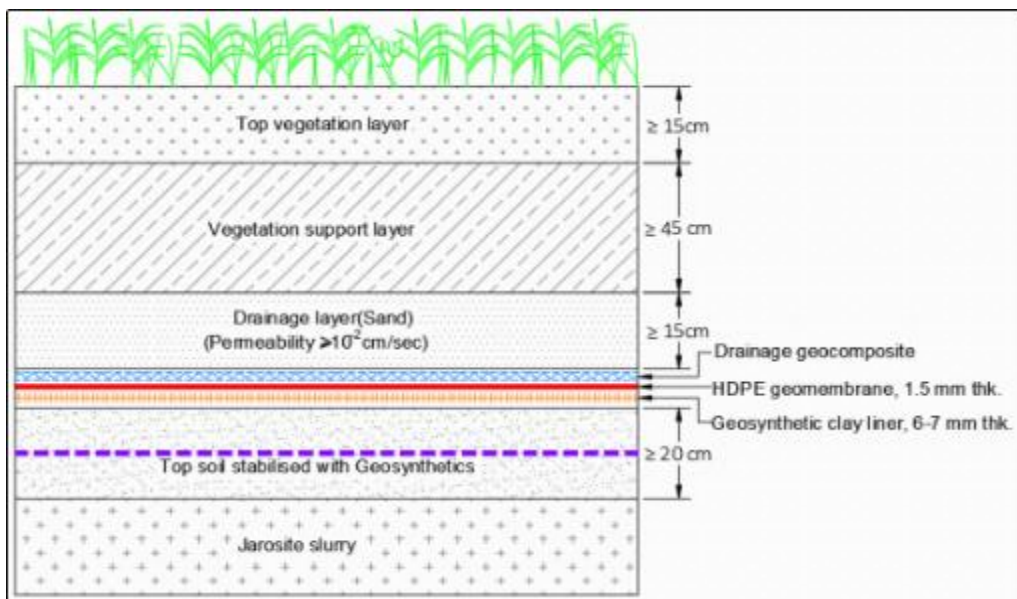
Typical cross section of lining system for closure and capping of Vizag Jarosite pond
